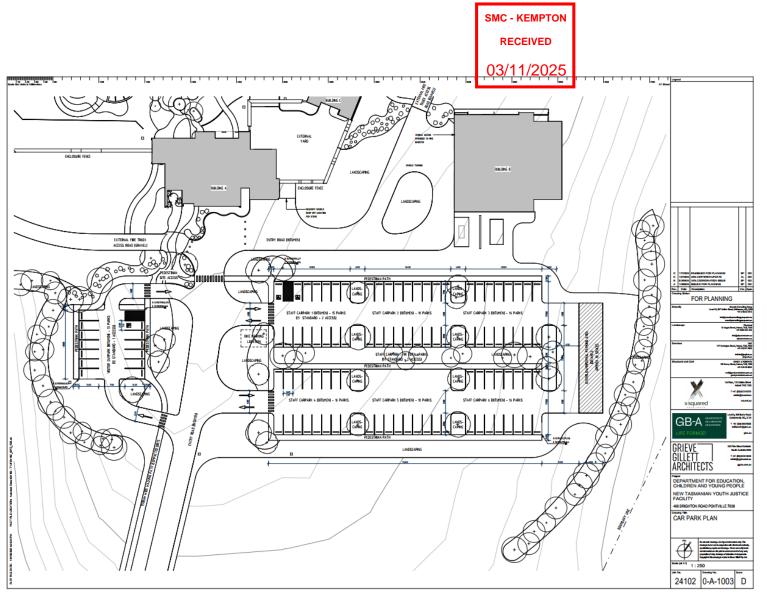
Carpark plan. (source Grieve Gillet Architects)
